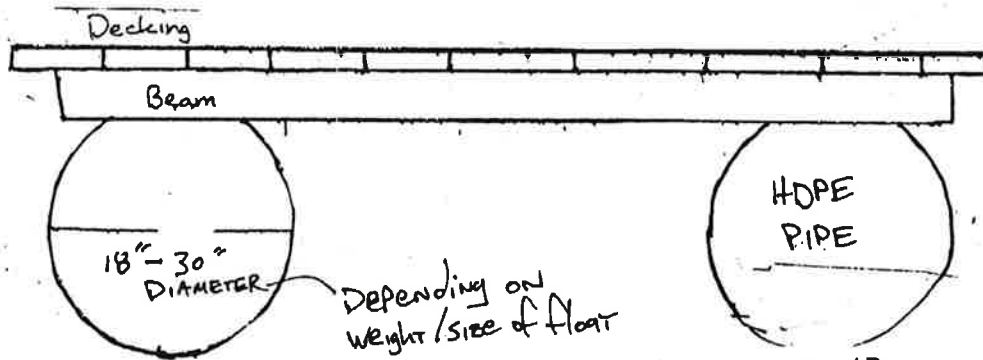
Cross-sectional Diagram - Work Rafts with processor located on Parcel B
